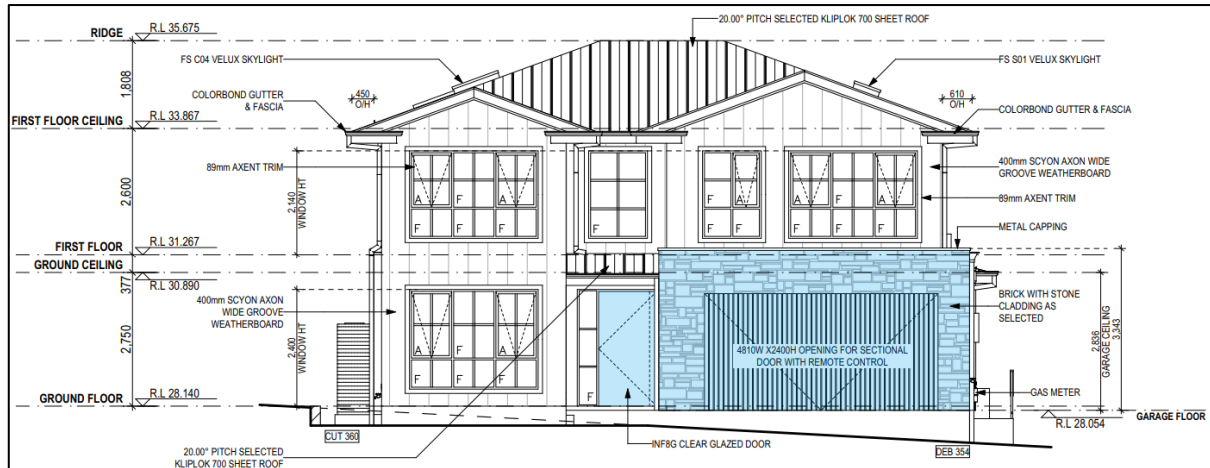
Southern Elevation (source: Hall and Hart, Rev G)
